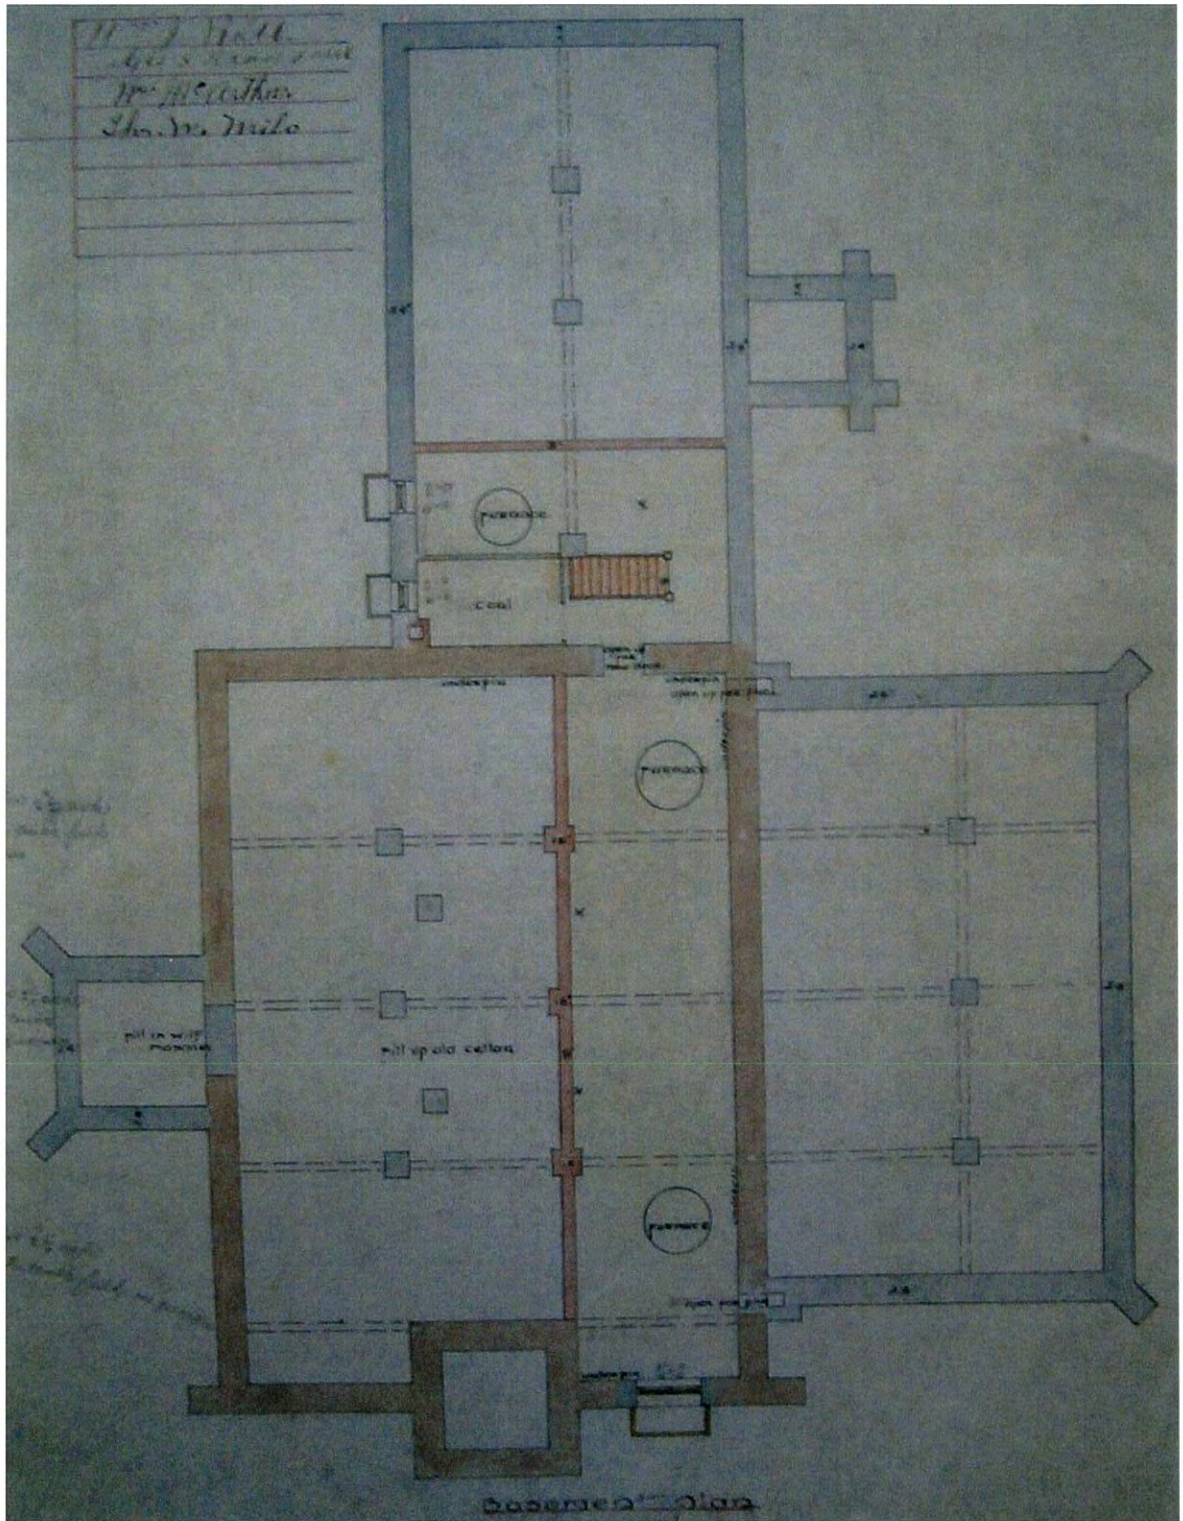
Architect William Newlans proposed renovations and additions to St. Andrews (basement plan 1898)
